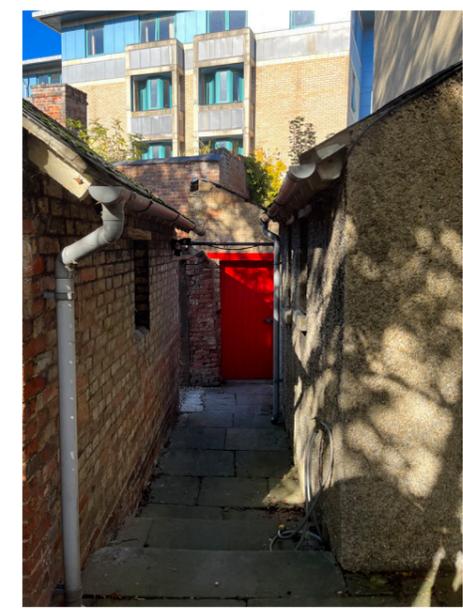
View of 20th c. toilet addition to the west wing and altered coal and wood store
